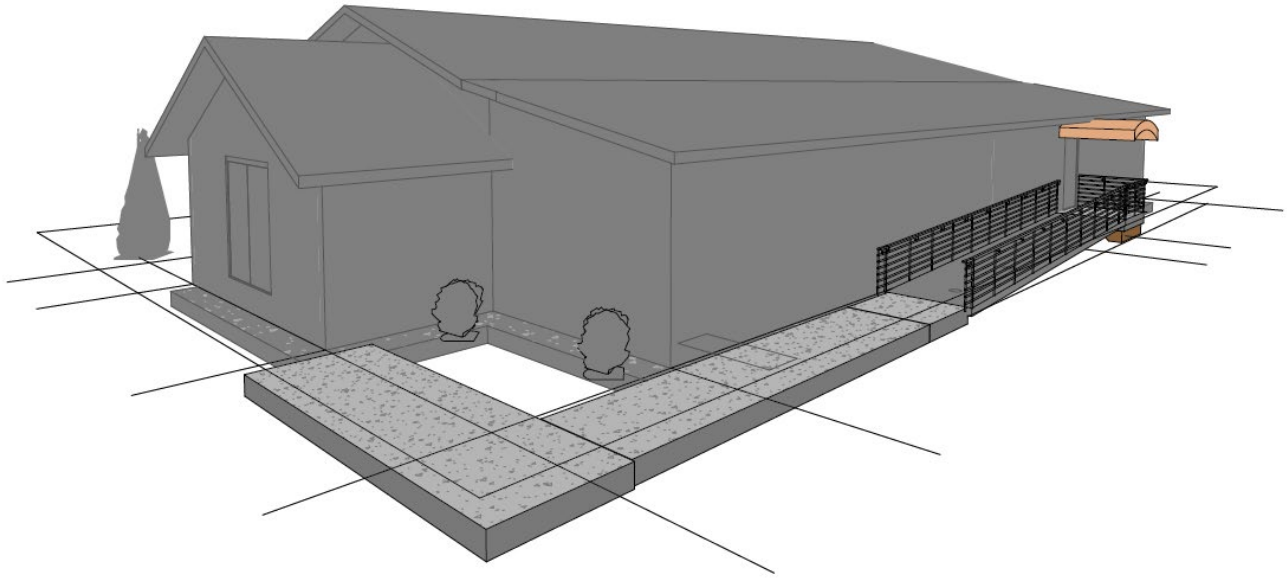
Rendering of the proposed emergency exit ramp and walkway.
